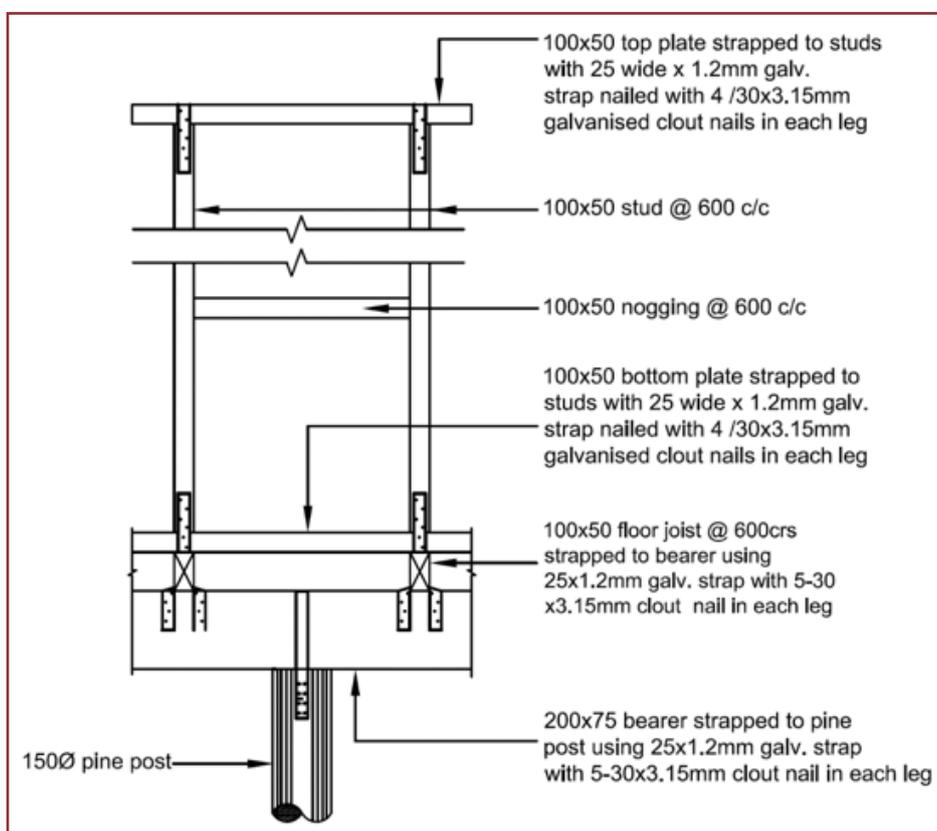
Strapping overview for timber stud wall (Source: Fiji Rural Housing Unit standard drawings)
